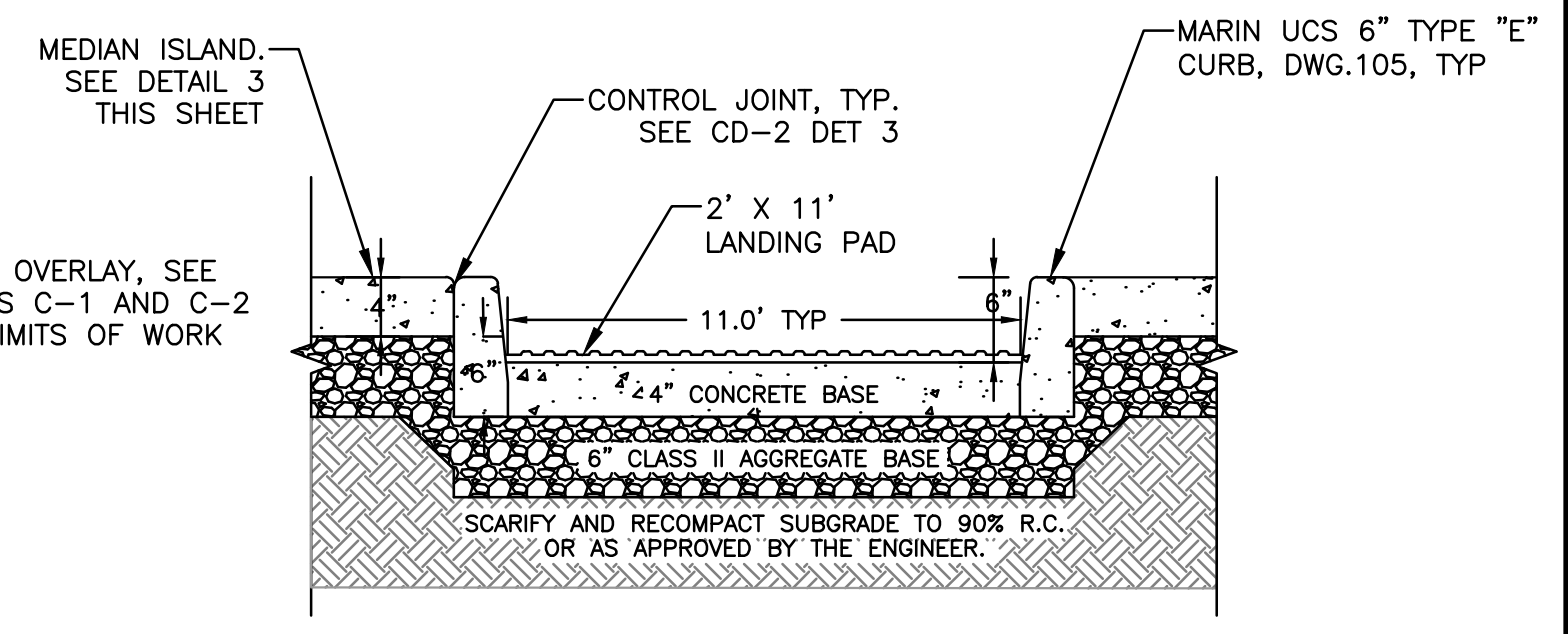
RAISED CONCRETE MEDIAN REFUGE ISLAND
